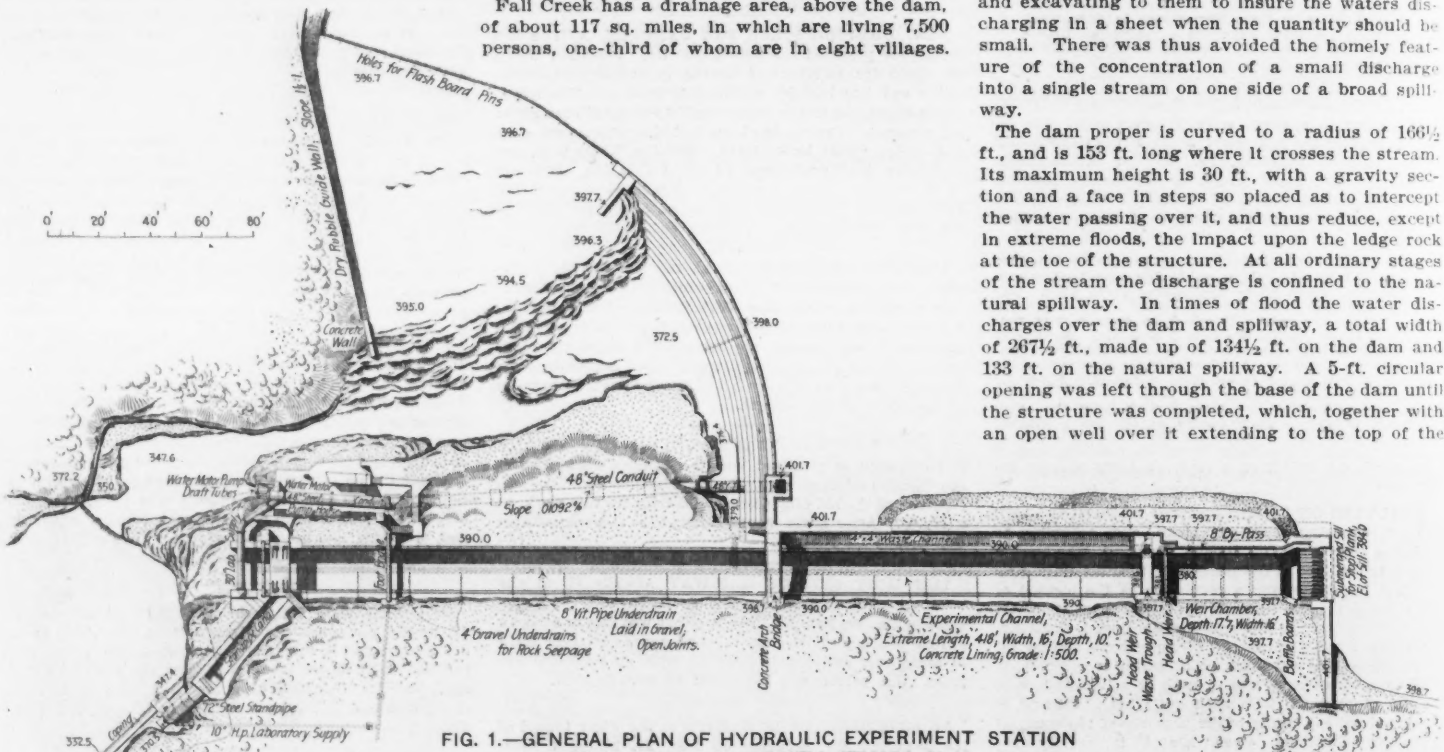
GENERAL PLAN OF HYDRAULIC EXPERIMENT STATION OF CORNELL UNIVERSITY, ITHACA, N. Y.
